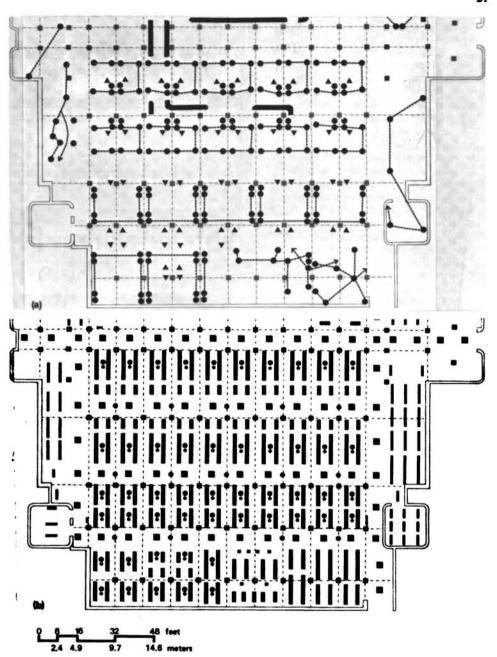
(a) Electrical power plan; (b) electrical lighting plan.
